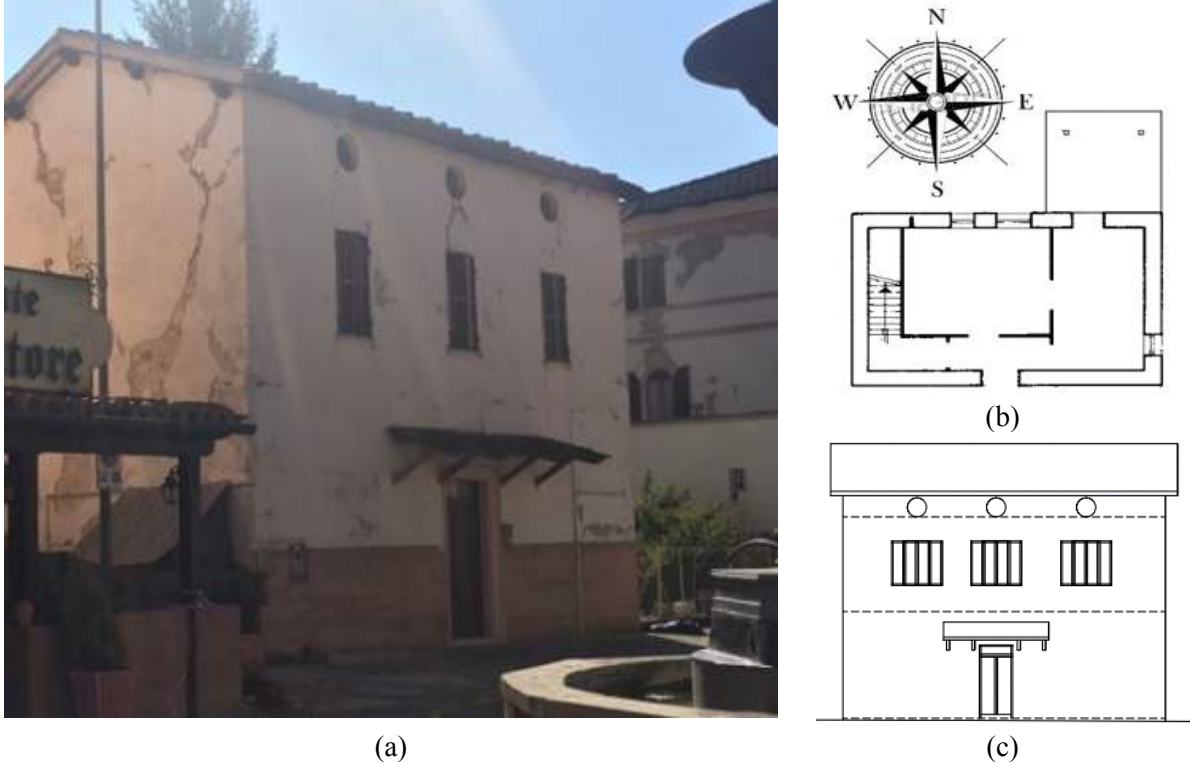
The case study building n.45, (a) street view, intermediate floor (b) and (c) North prospect.
